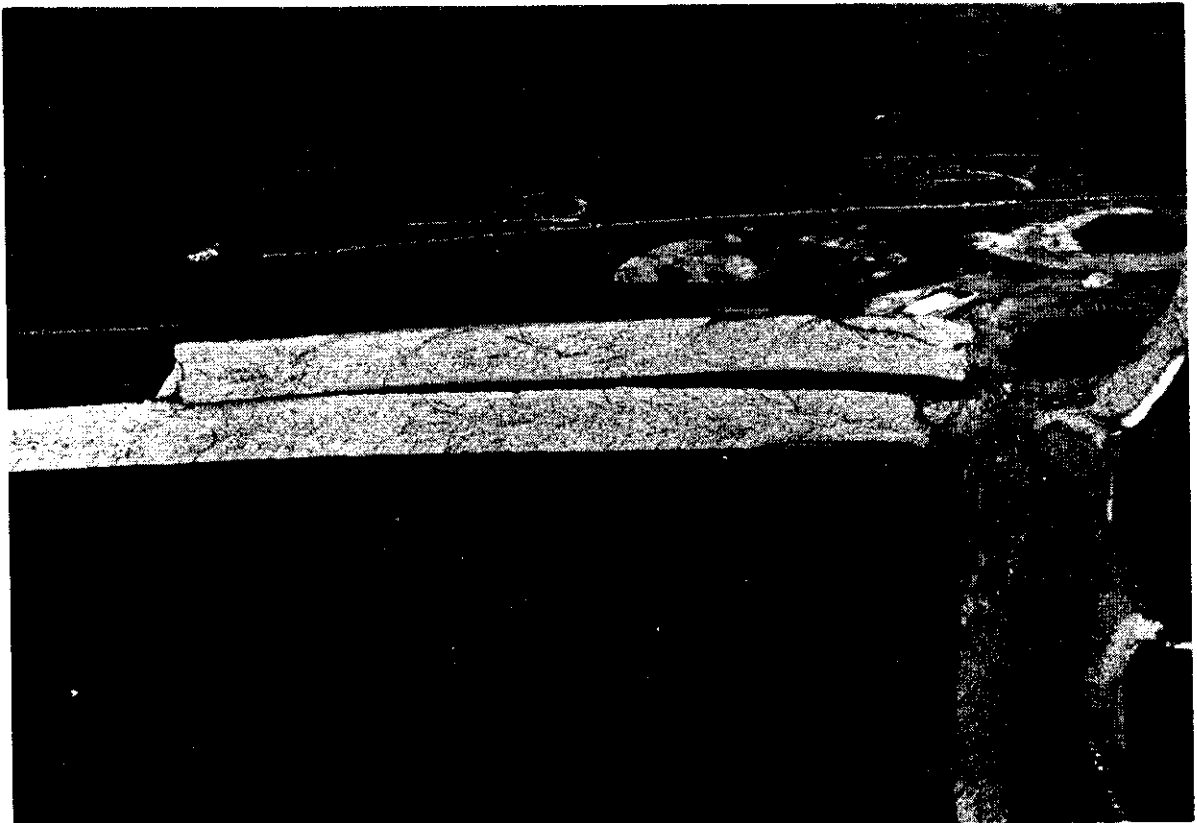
Specimen 32: Fracture pattern in deck and doubler
